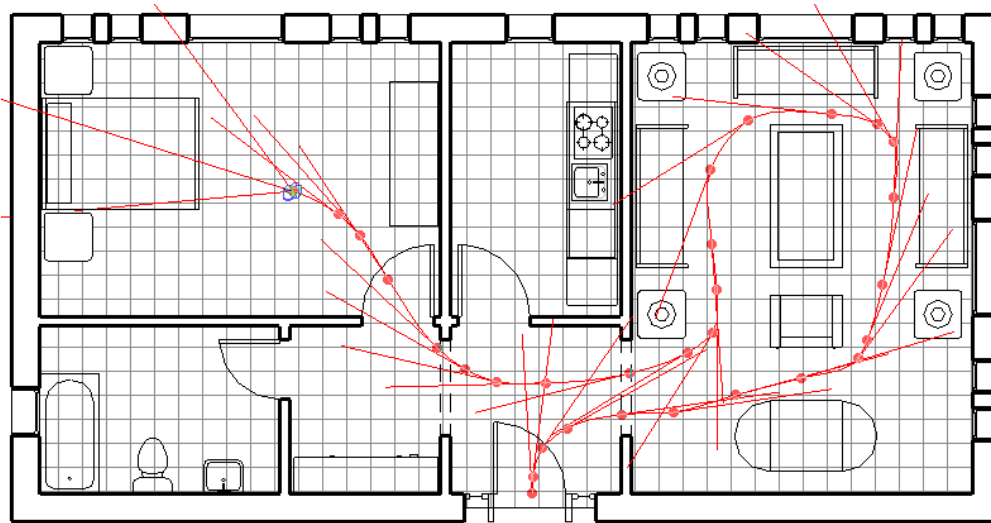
Sketch plan showing the walkthrough path for the Apartment 1 project
